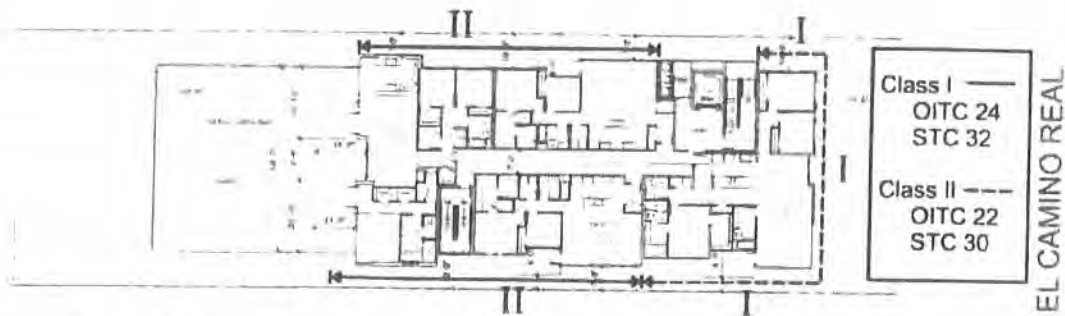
C: Minimum recommended glazing ratings for Floor 3, Floor 4, and Floor 5
